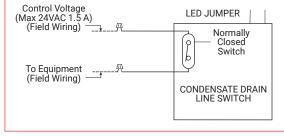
FIG. E: WIRING DIAGRAM WITH CUT JUMPER WIRE
